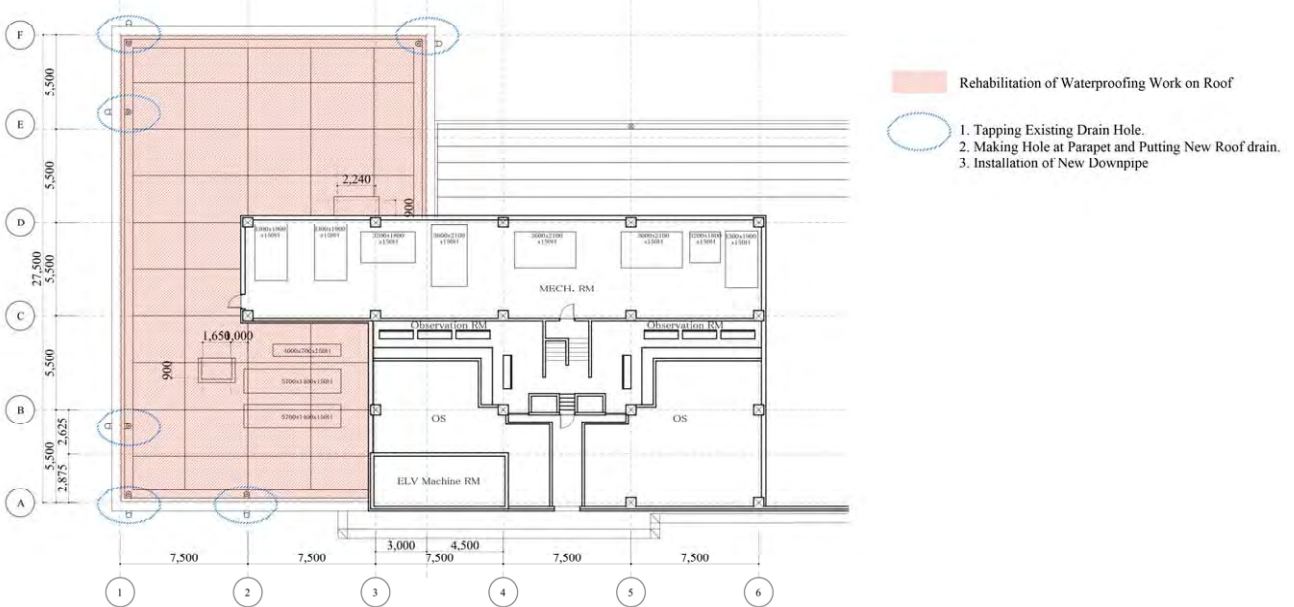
Roof Waterproofing of Annex 3 (above ICU)
